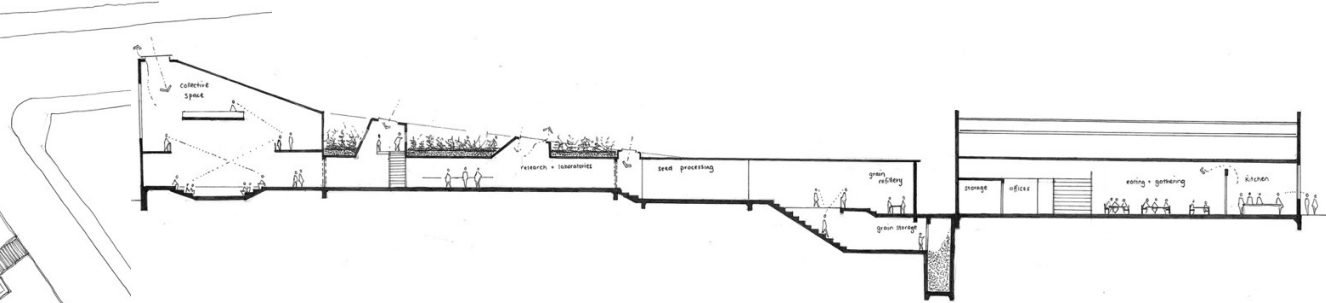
Iteration 2, West elevation : (Author, July 2021)
